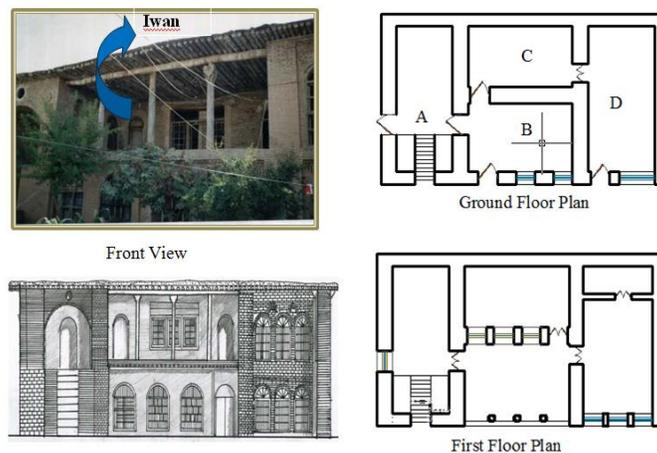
Shows the plans and elevation of traditional house type [Source: Author].
